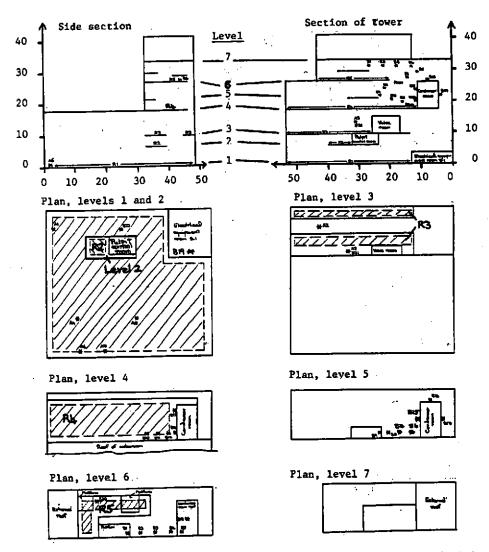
Plans and sections of the ladle metallurgy facility, as modelled for ray tracing, showing its dimensions (in metres), source positions and receiver planes.
